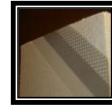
Class PB-EIFS wall System design Architectural Elements
